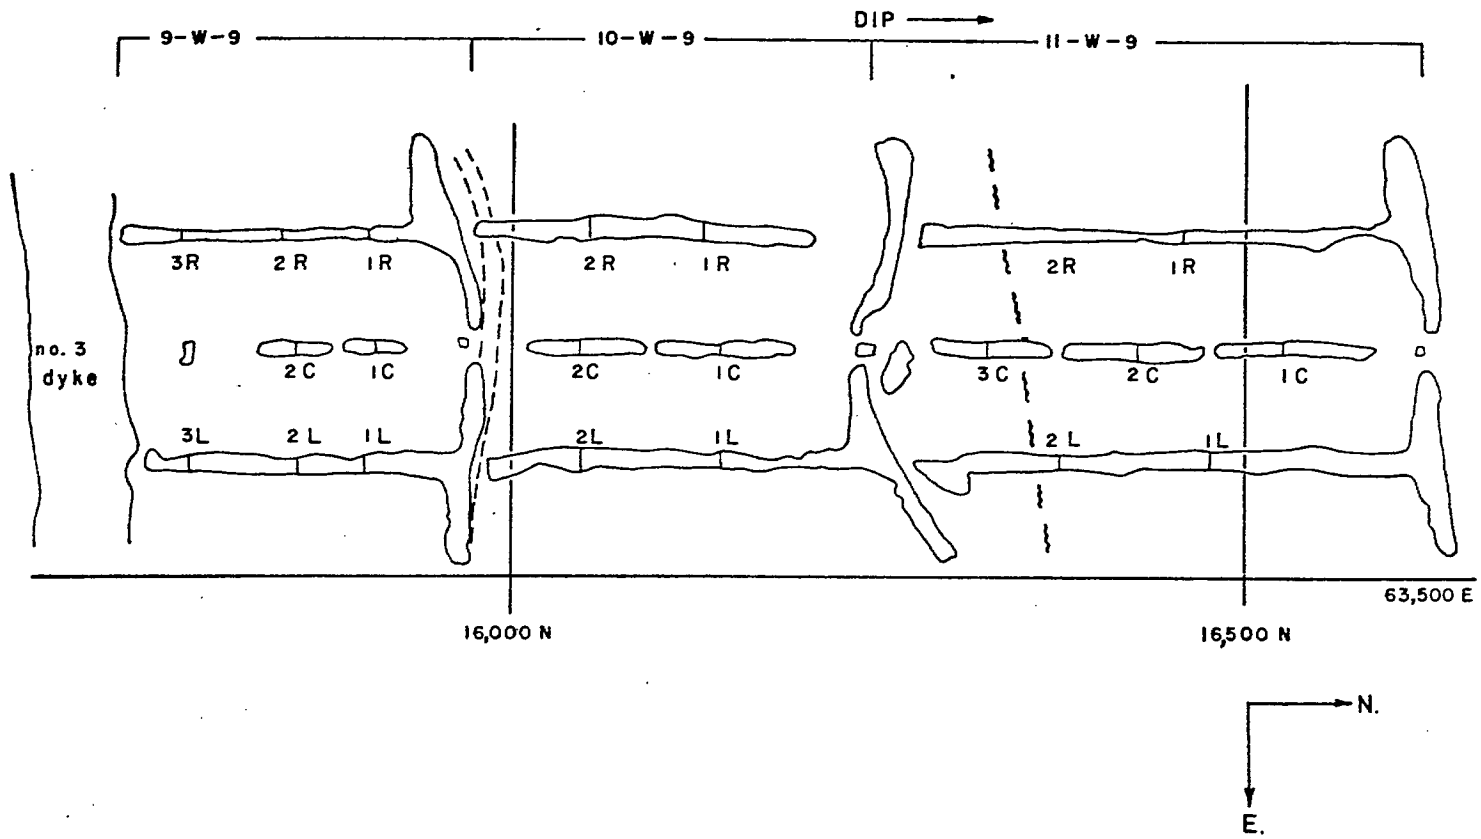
Plan of stopes showing pillars in which measurements were taken.
